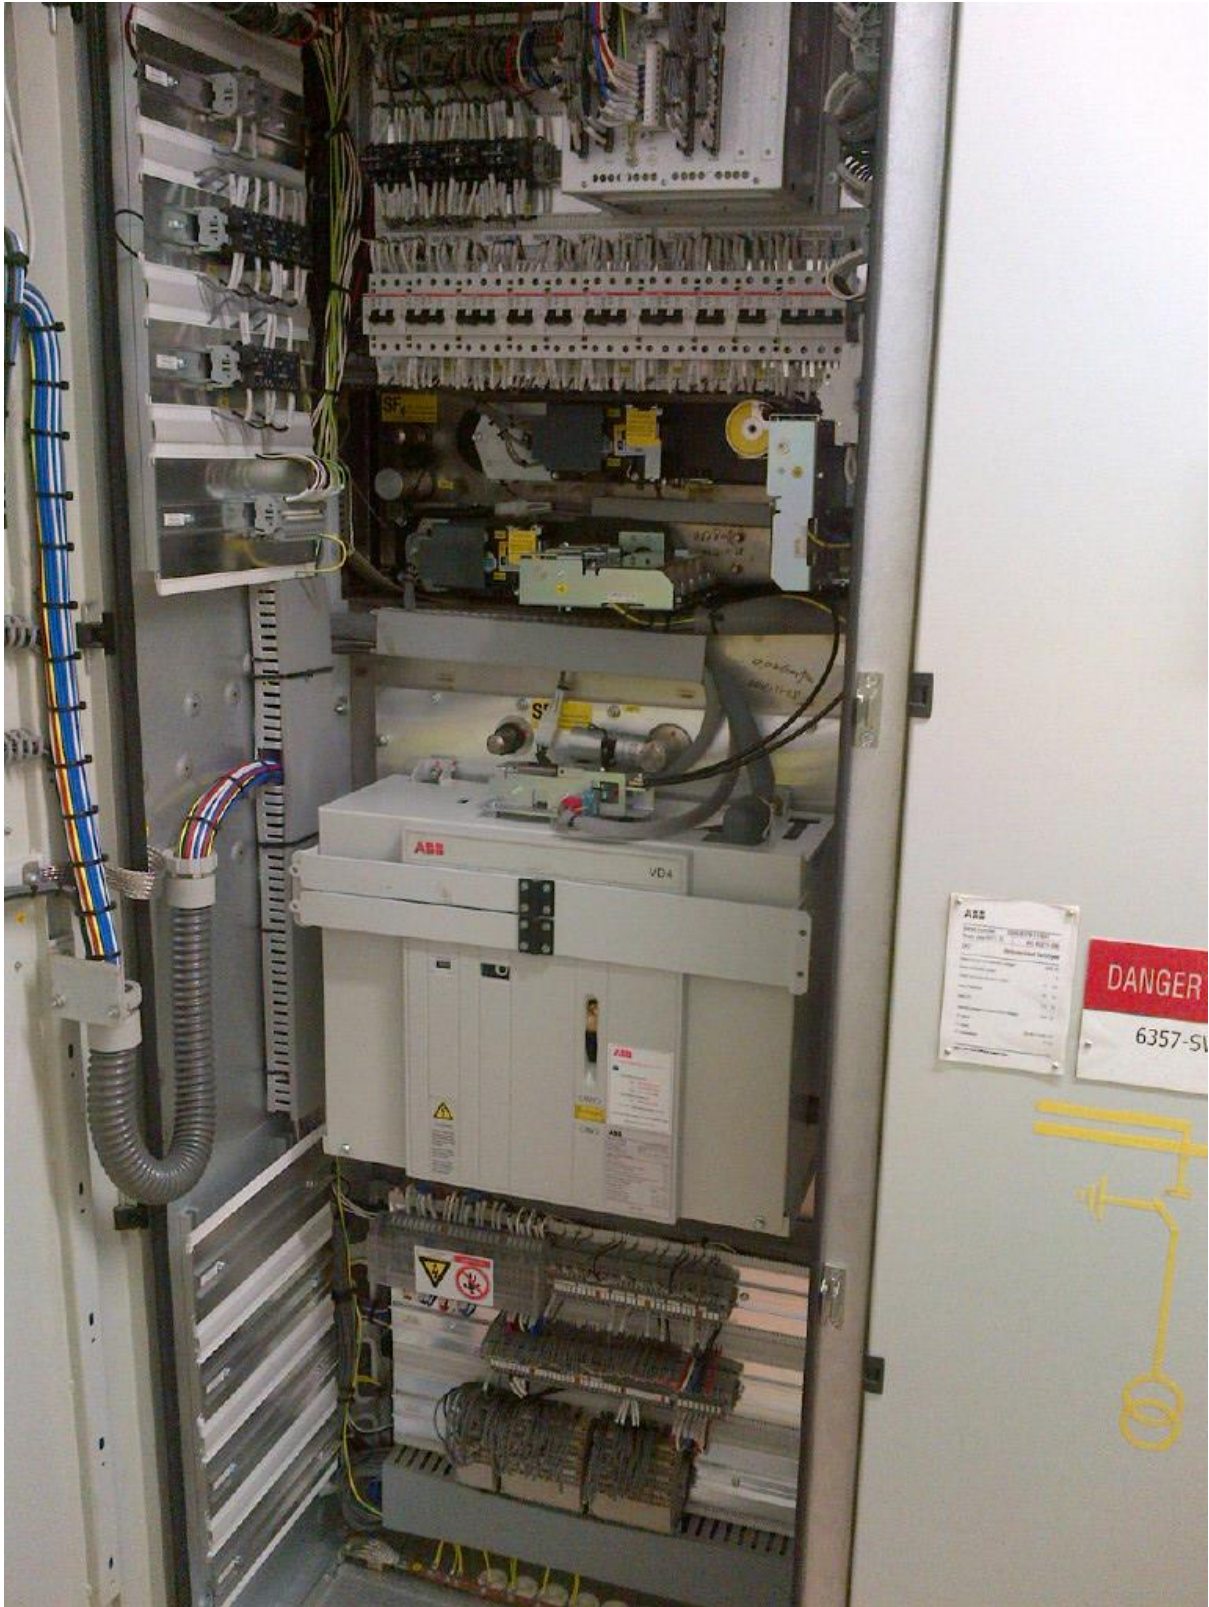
33kV Gas Insulated Switchgear (GIS) board showing internal arrangement
